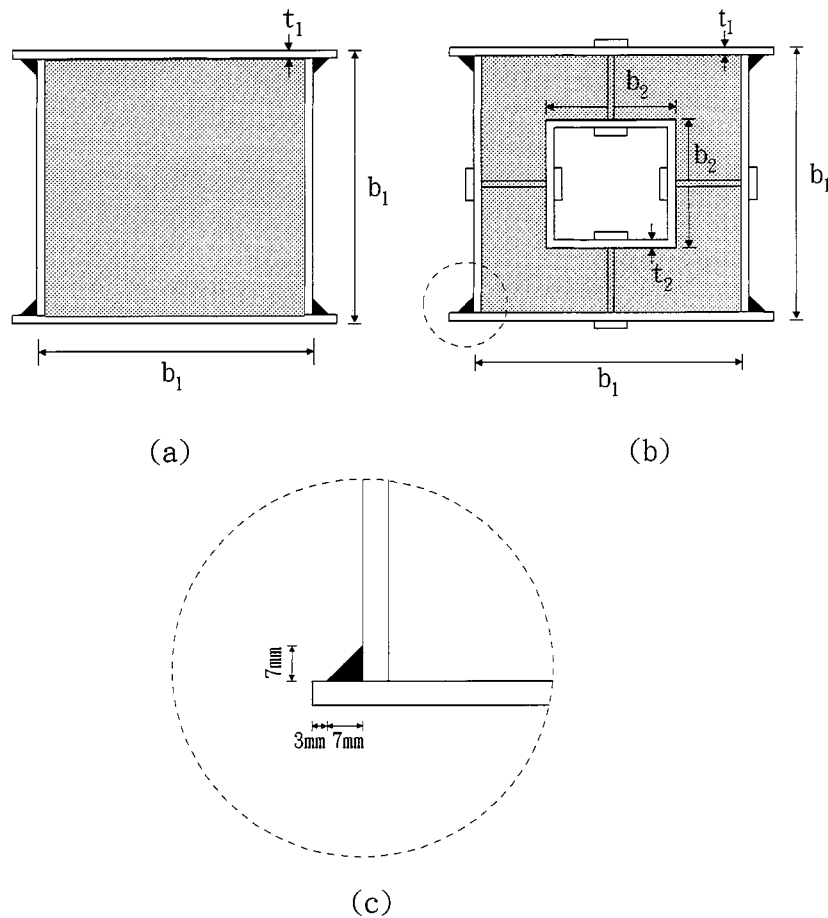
Description of test specimens: (a) cross-section for CFT; (b) cross-section for sandwich members; (c) details of corner fillet welds
